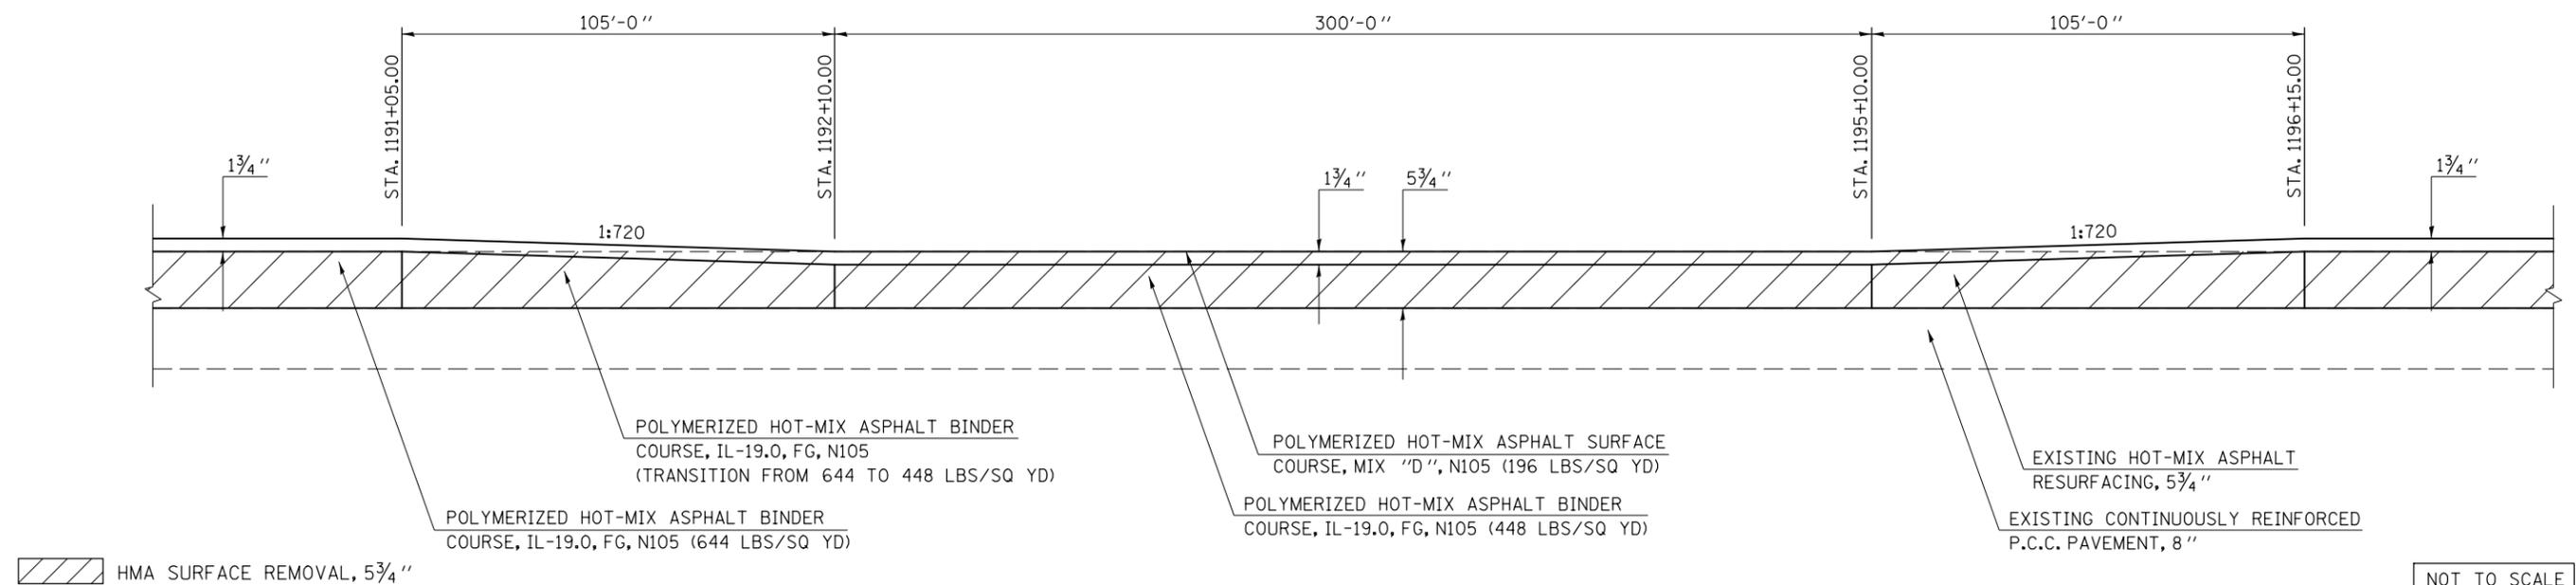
MILLING & PAVING TRANSITIONS UNDER S.N. 057-0130
